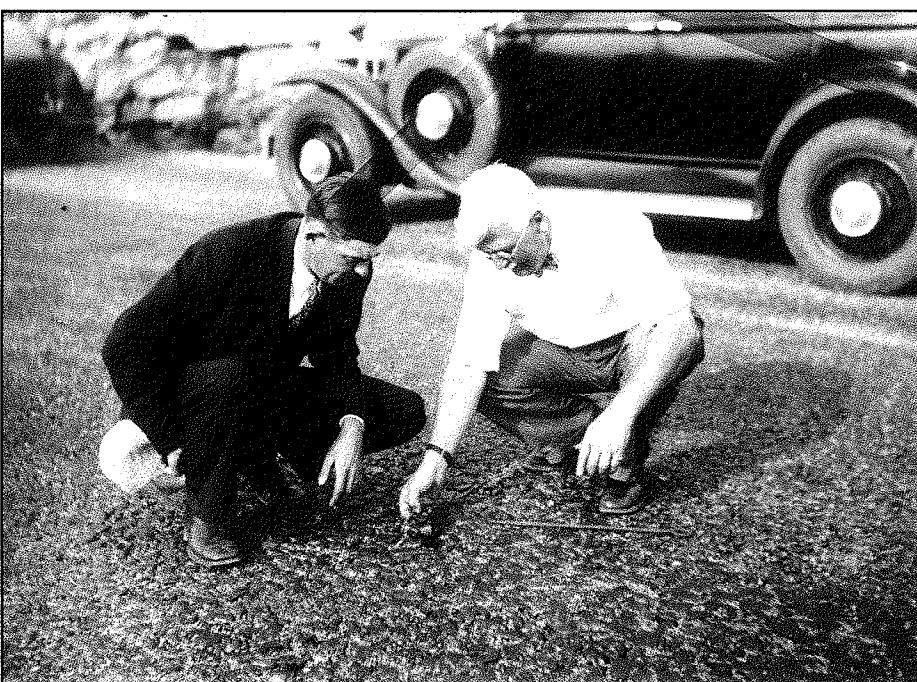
Highway engineers examining the pavement surface, Cadillac Mountain Road, 1932. Photograph courtesy National Park Service, Acadia National Park Archives.
